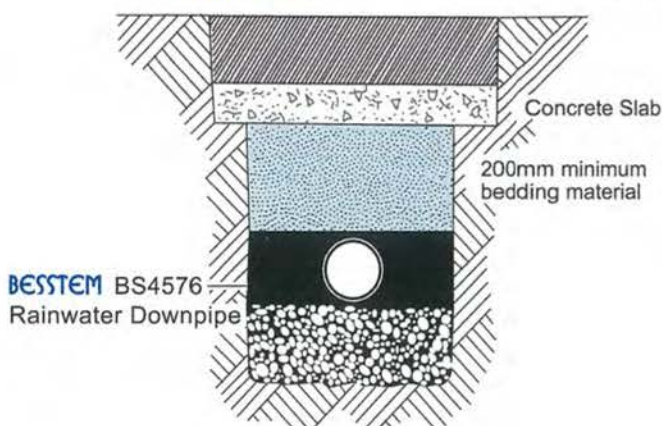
Protecting Underground Pipe from Loads for Normal and Medium Type of BESSTEM BS4576 Rainwater Downpipe
